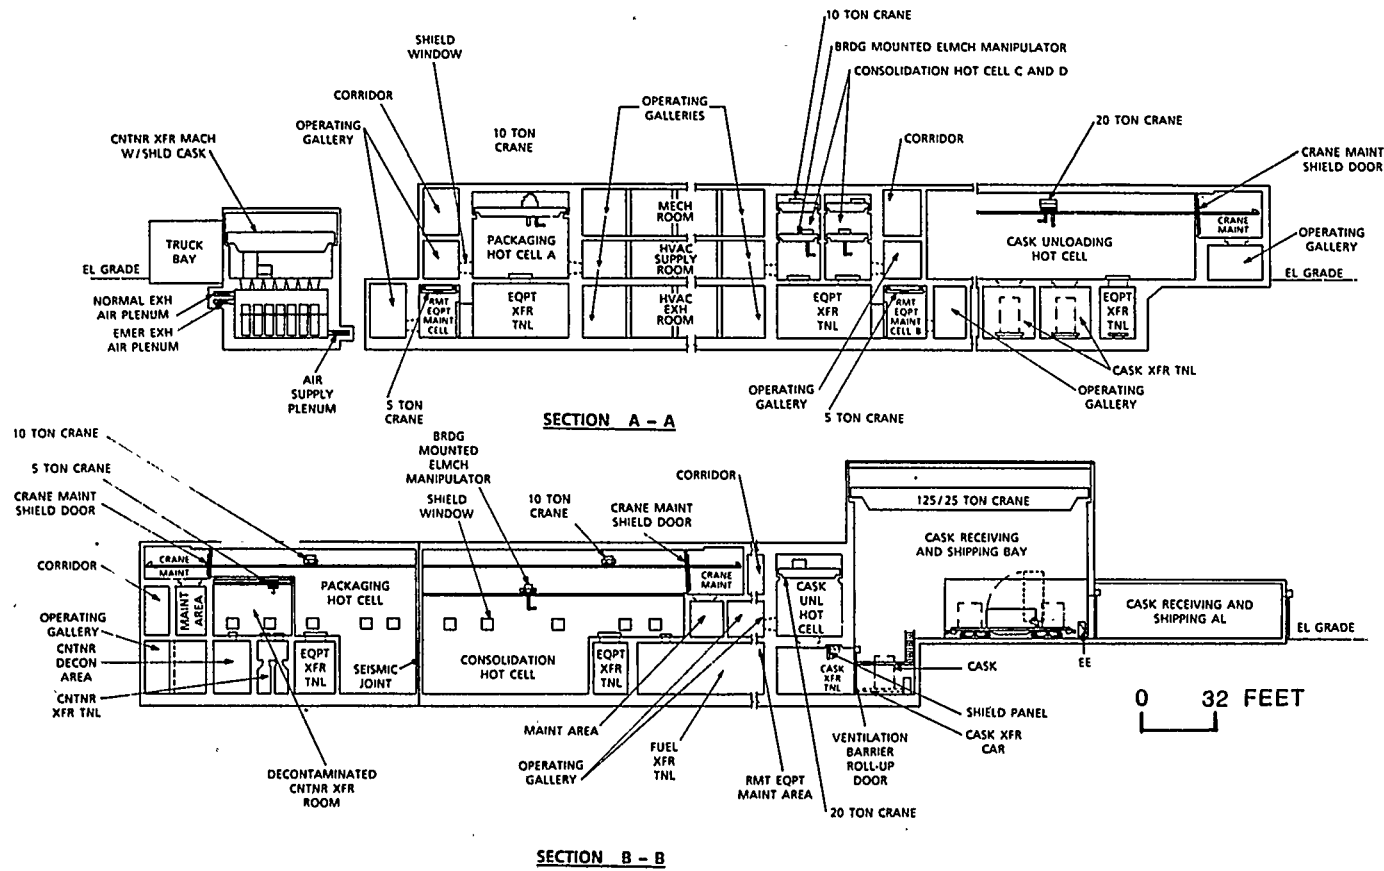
Waste handling building 2, preliminary general arrangement.
